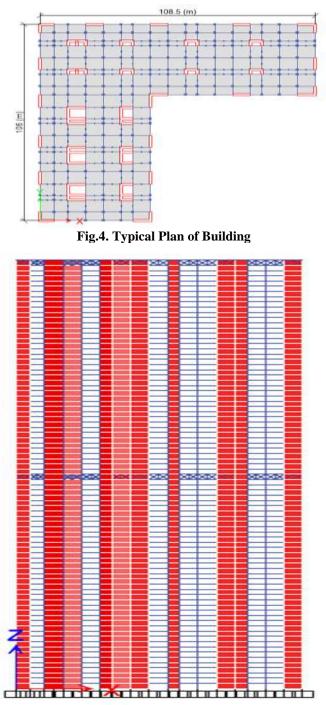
Elevation (Model No 5- OUTRIGGER AT Top & 0.5H i.e. height of building)
